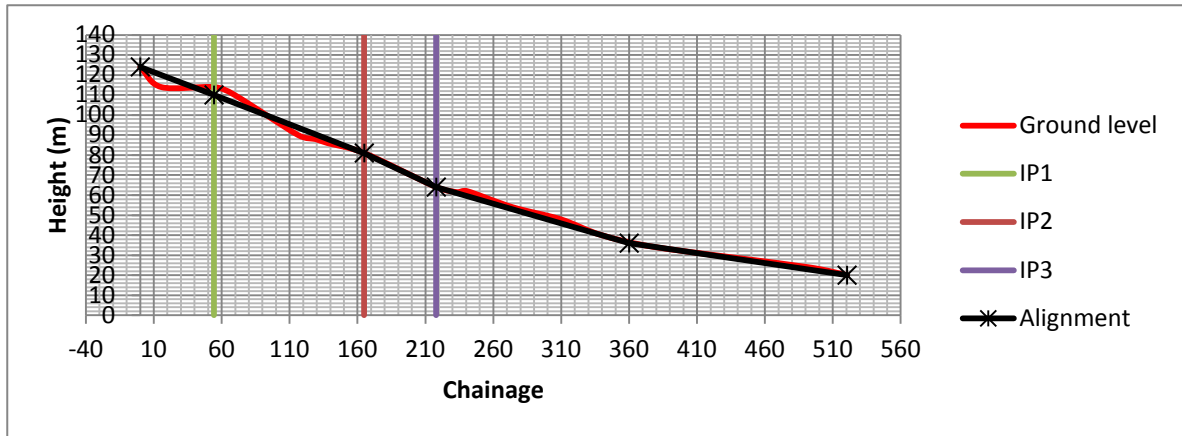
Longitudinal Sectional Land Profiling from intake point to powerhouse for Mhogha
